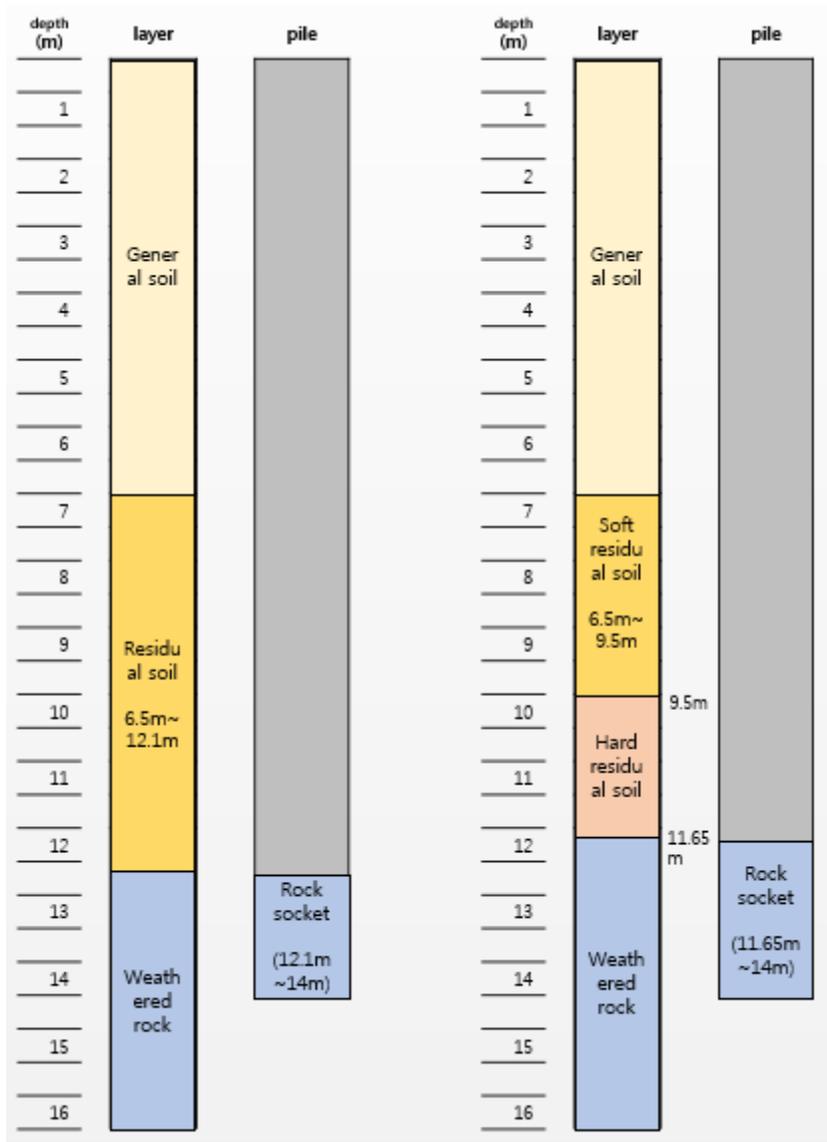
Section view of the subsurface layer for pile No. 4 before and after Modification
